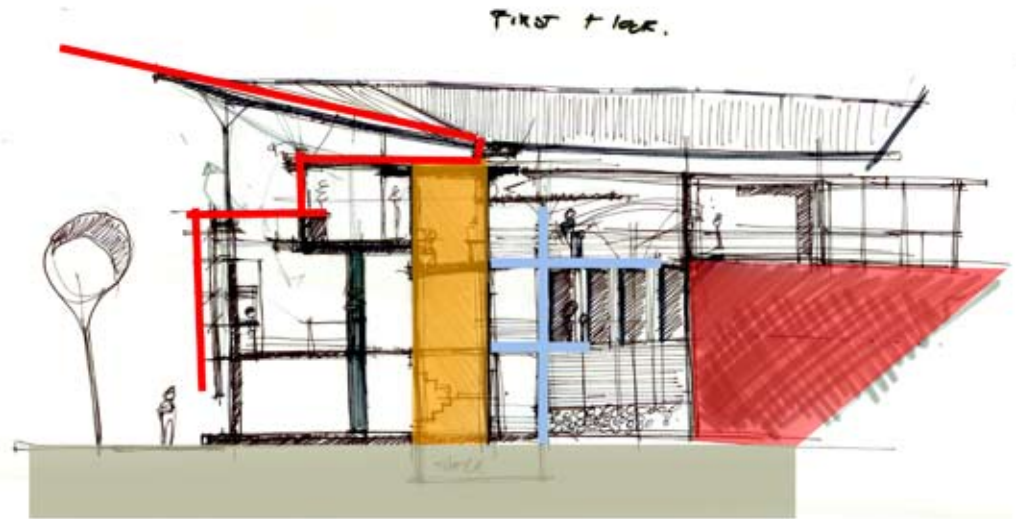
Elementary design section illustrating the skin, wall and detached circulation network
